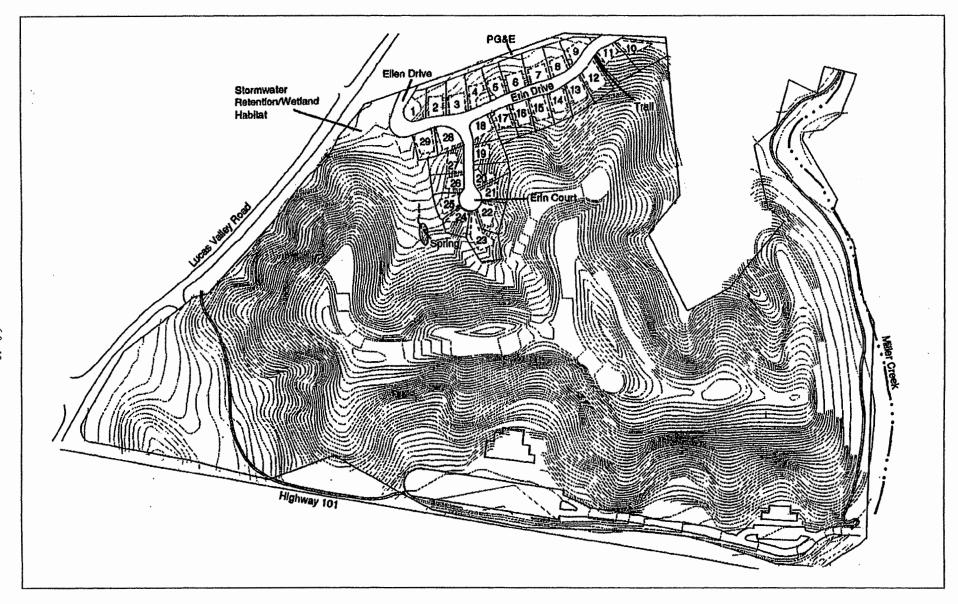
29-LOT SUBDIVISION ALTERNATIVE Oakview Master Plan
